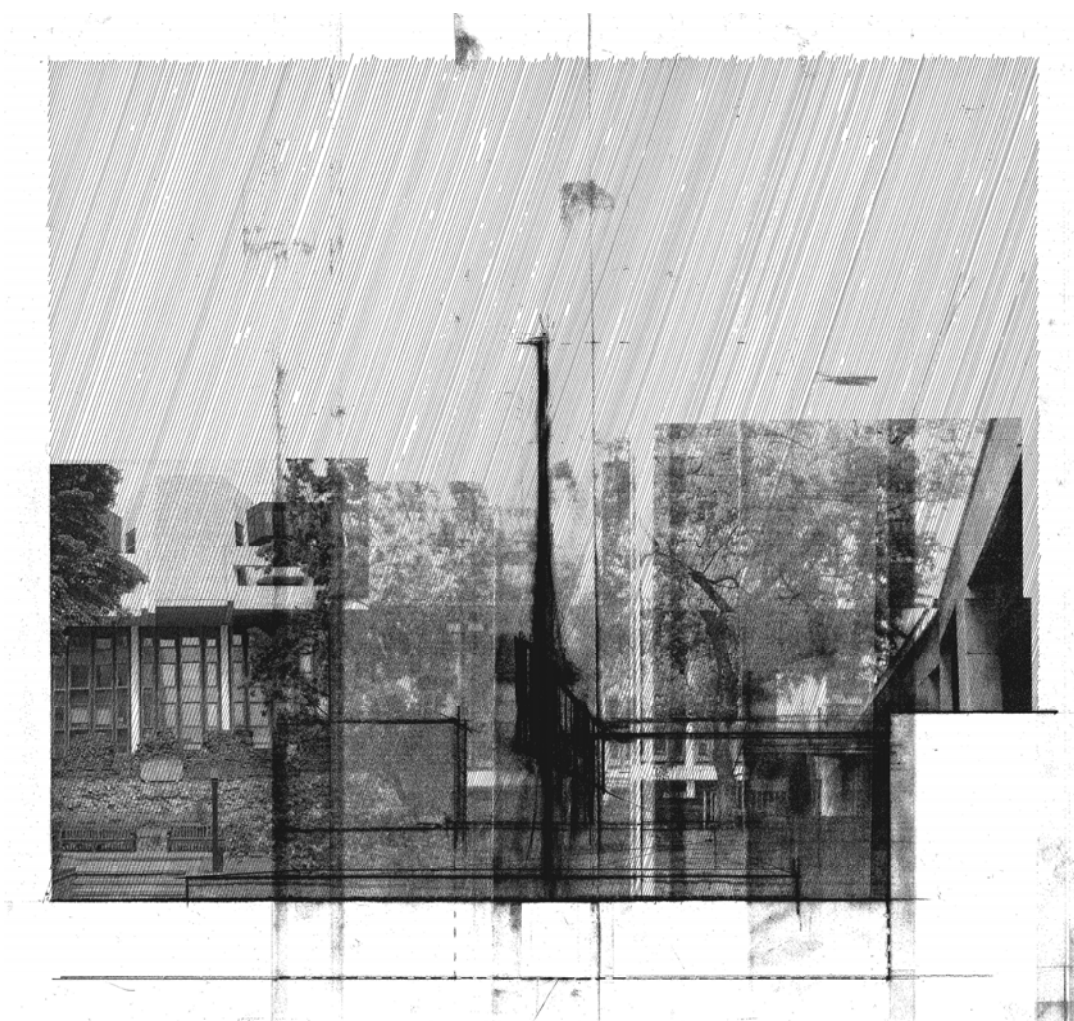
Proposed gantry and mechanical spire, section looking north towards the fragment of city wall from upper level garden.
